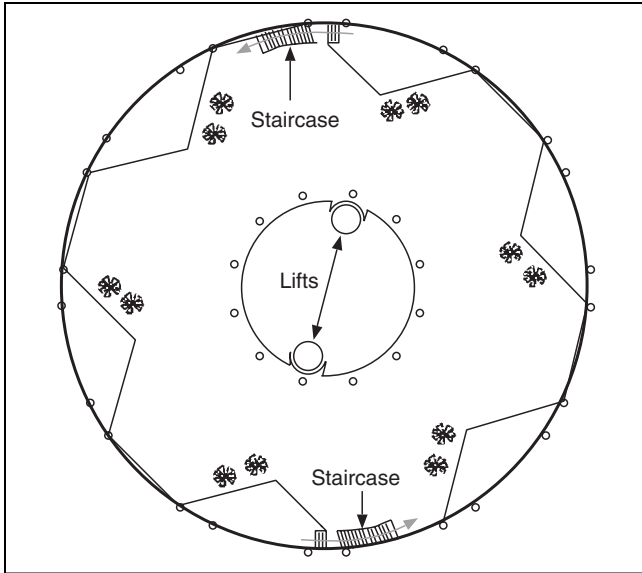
Typical floor plan indicating the positions of lifts and staircases
